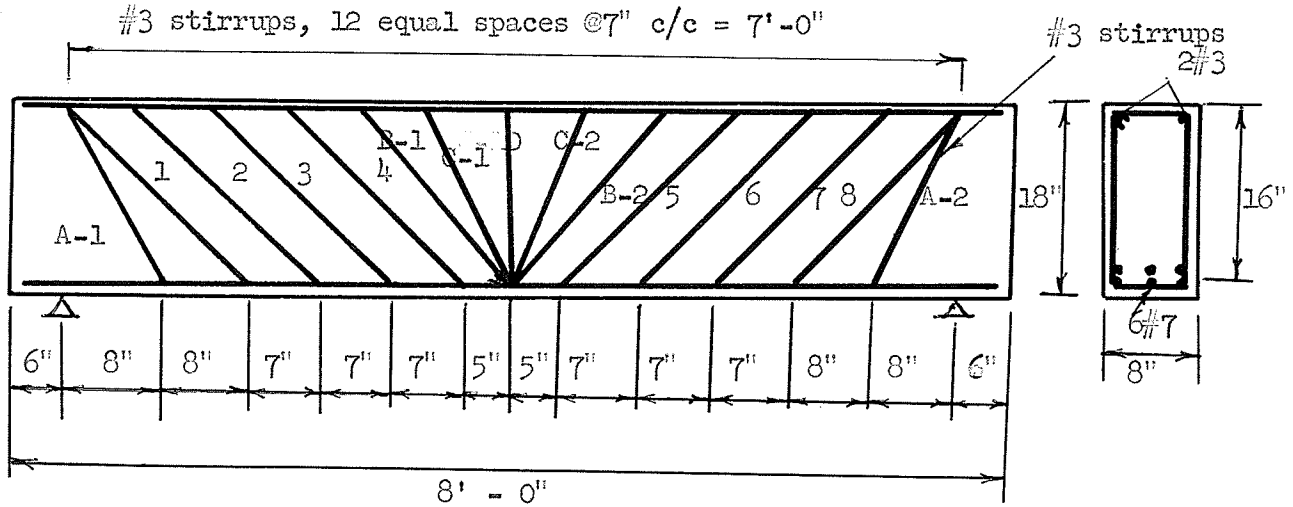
SKETCH OF REINFORCEMENT BEAM 5
